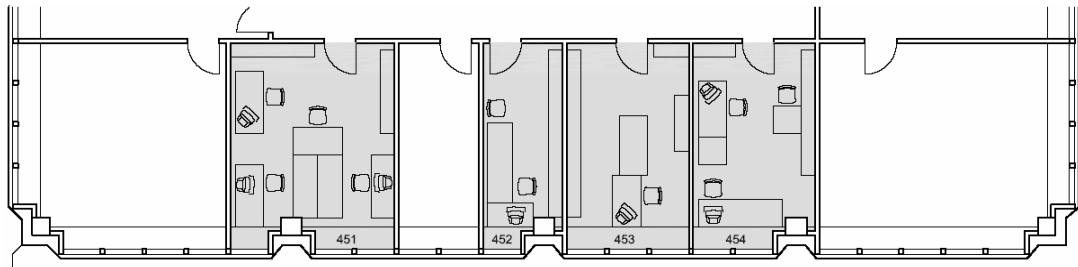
Schematic plan of the monitored rooms in the 5th floor
